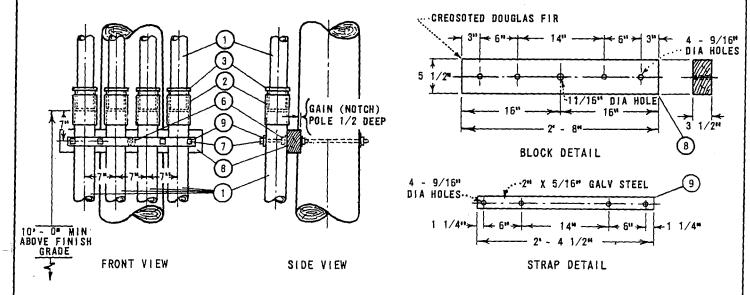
GALVANIZED PIPE RISER SUPPORT DETAIL
